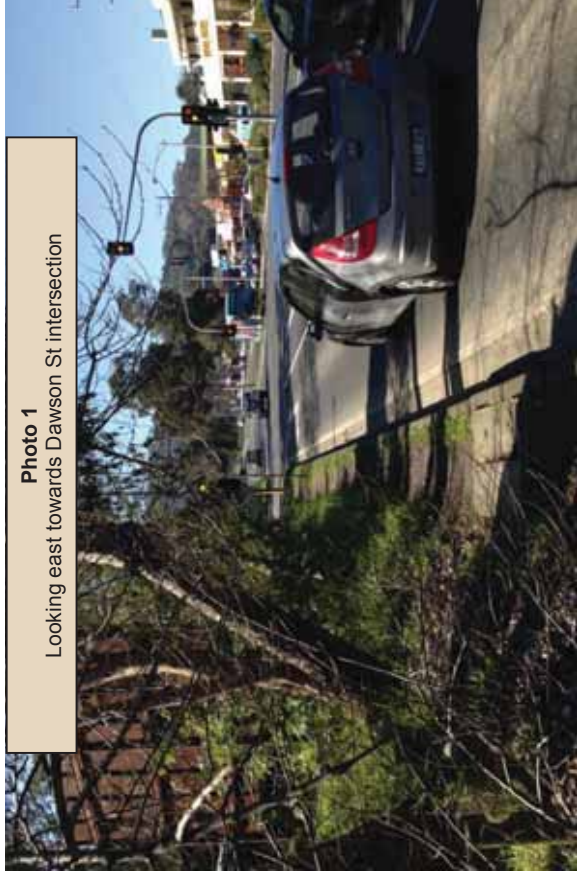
Burwood Highway – North Side: Slip Lane to Dawson Street - Construction of new footpath (examples of informal pathway)
